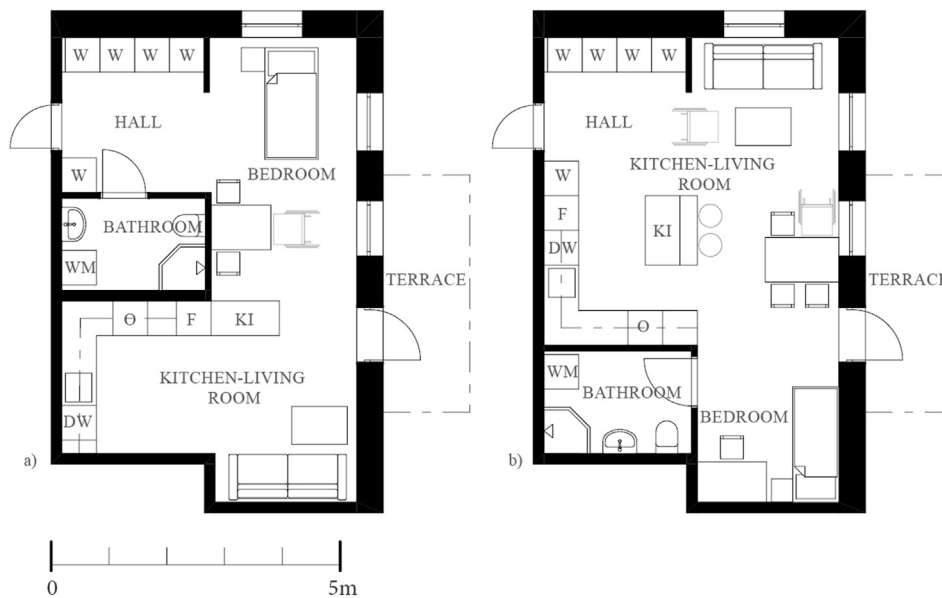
Apartment floorplan (a) with an adverse initial room organisation (42 m²; Source: illustration by Anita Ollár, original floorplan by White Arkitekter) and (b) with a possible rearrangement of the floorplan design (proposal by Anita Ollár). DW: dishwasher, F: fridge and freezer, KI: kitchen island, O: oven and stove, W: wardrobe, WM: washing machine.
